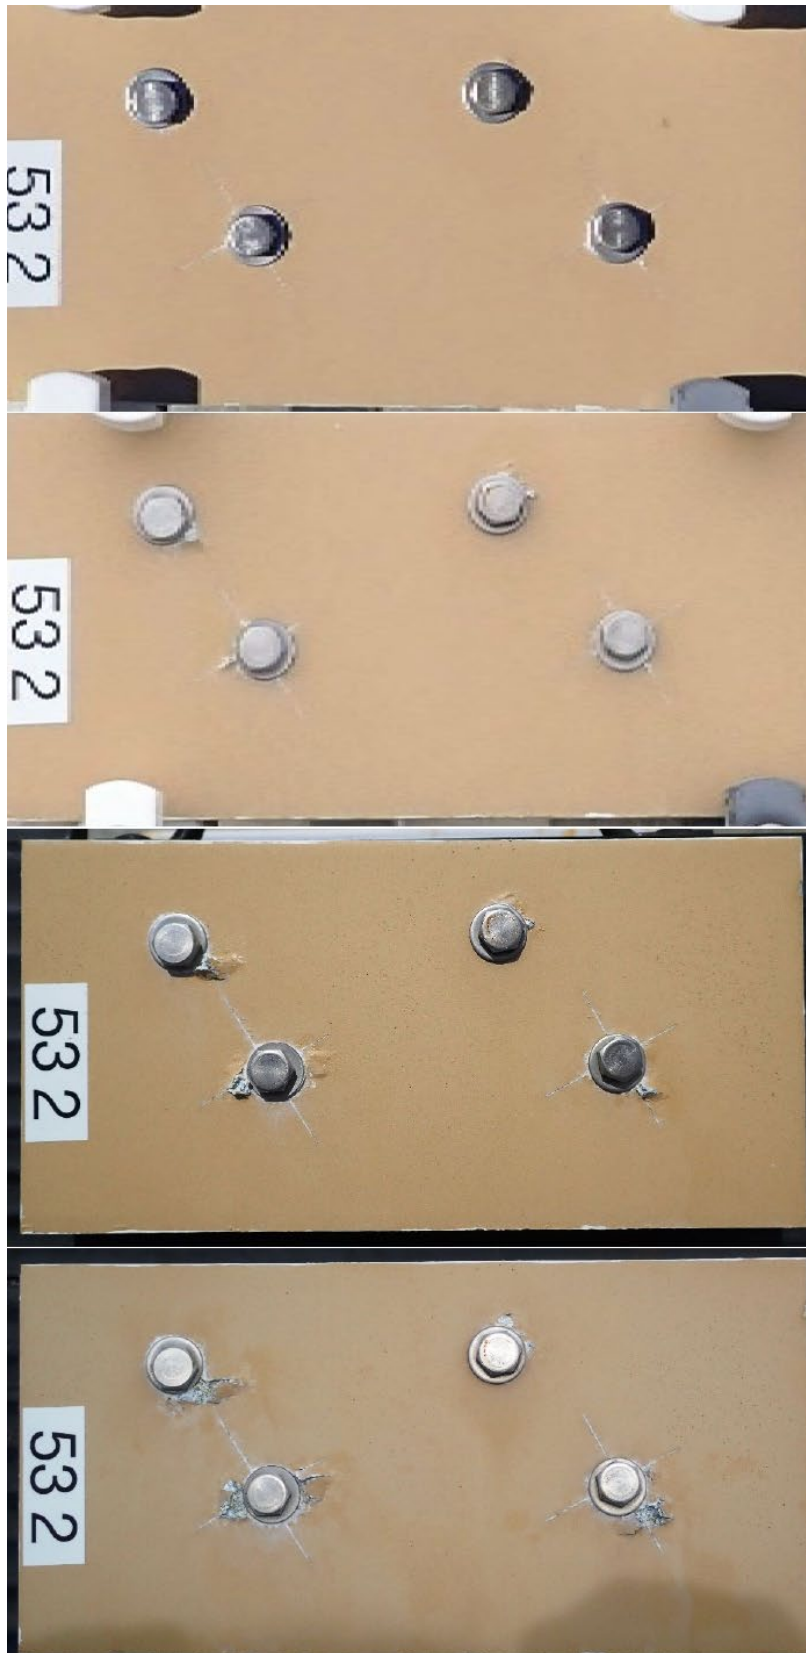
Panel 53-2 top-bottom: 3-, 6-, 9-, and 12-month inspection images
